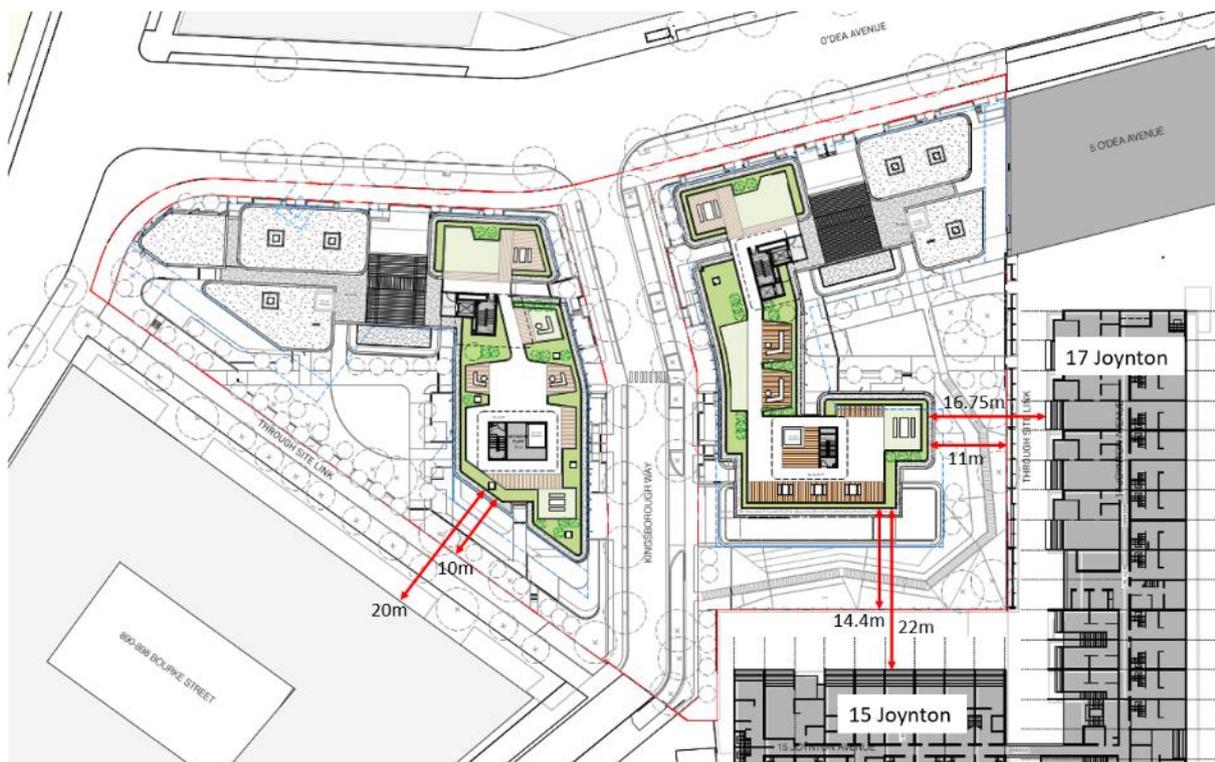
Proposed rooftop plan depicting communal open space and separation distances
